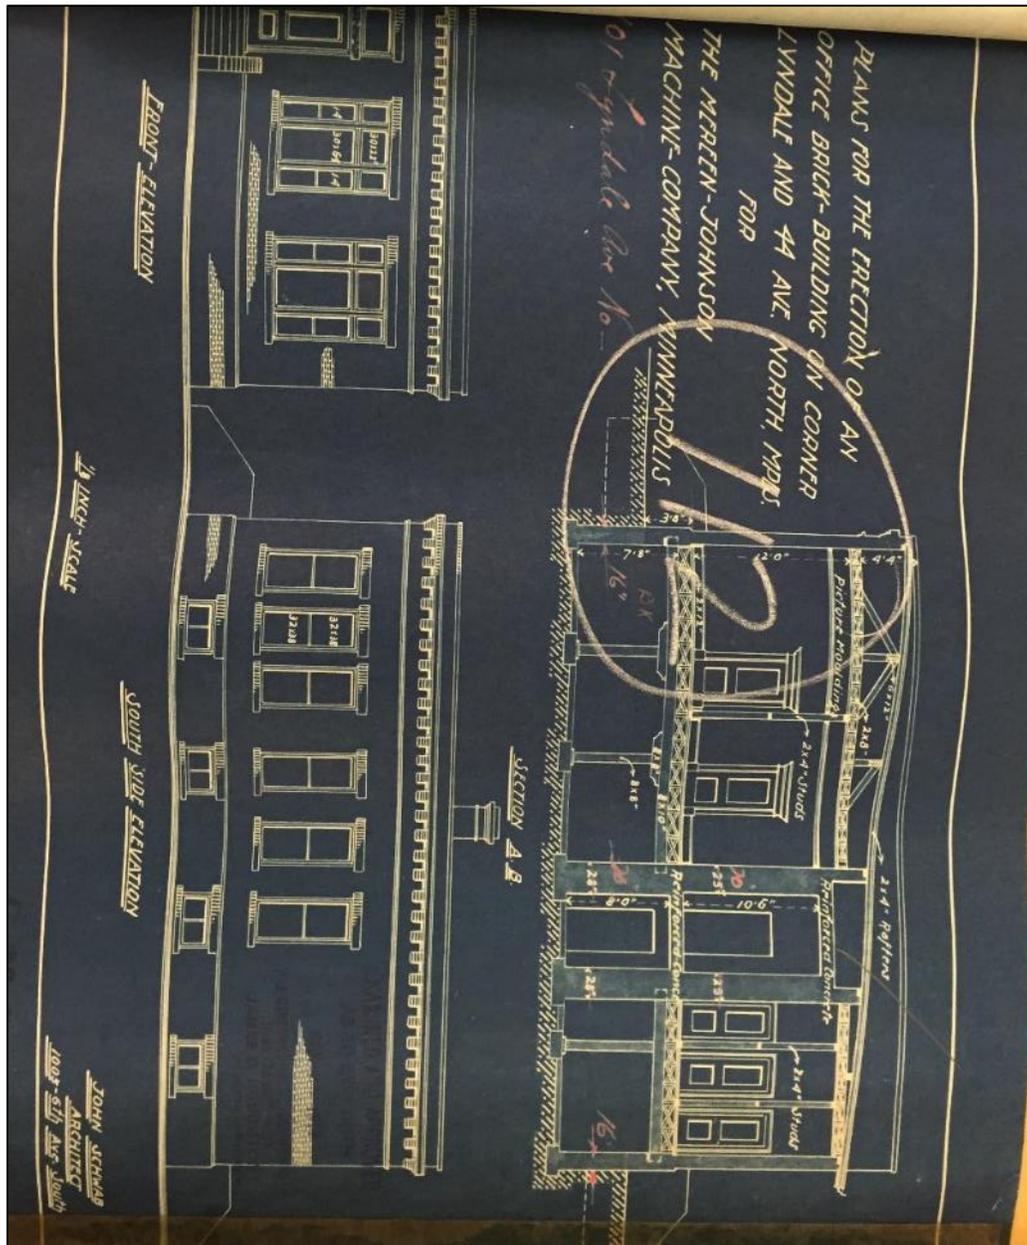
Merreen Johnson Office Building front elevation, south side elevation, and section A and B elevation. "Merreen-Johnson Machine Company," Minneapolis Plan Vault Collection, Box 304, Northwest Architectural Archives, University of Minnesota.
